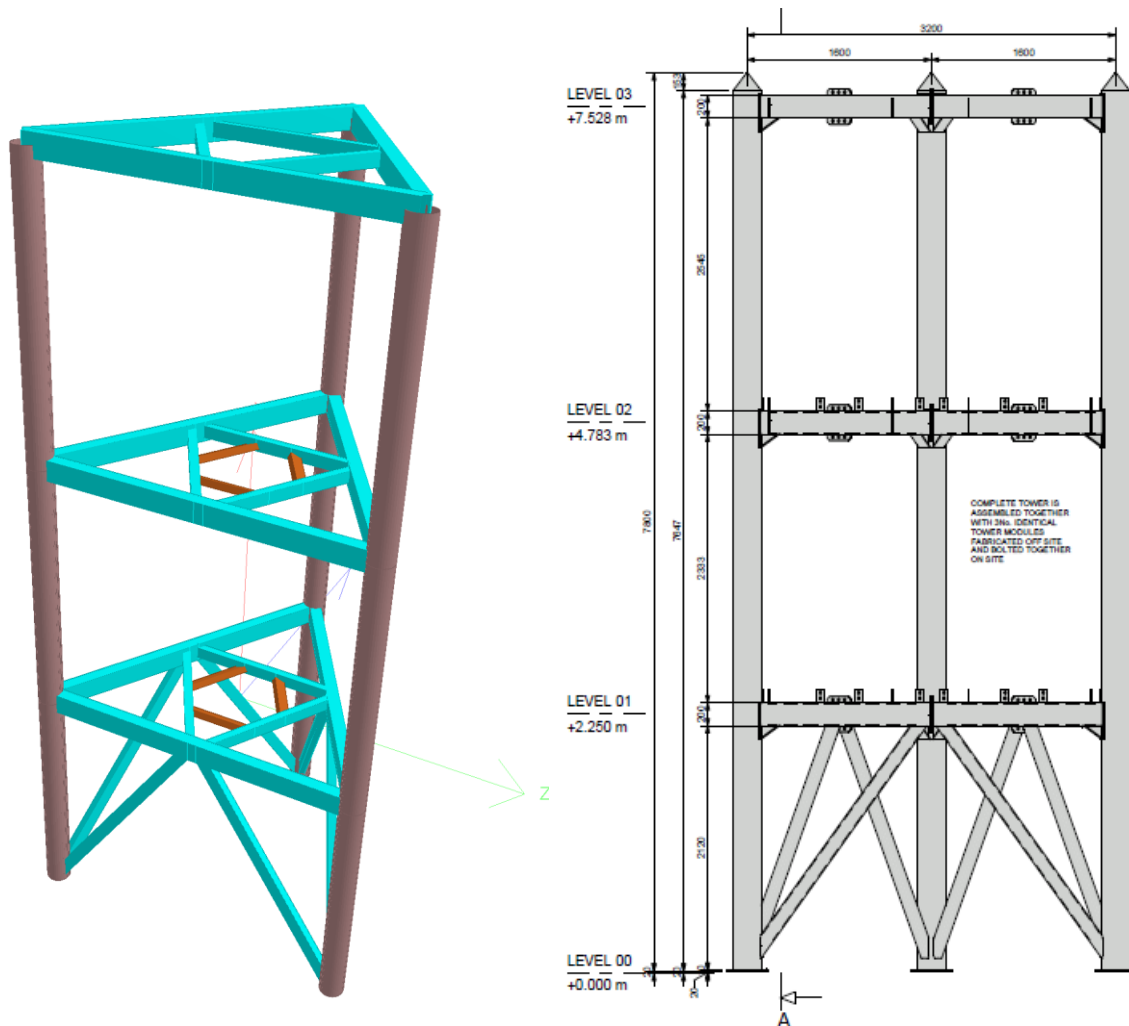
Main Steel Frame Elements of the Tower Structure
